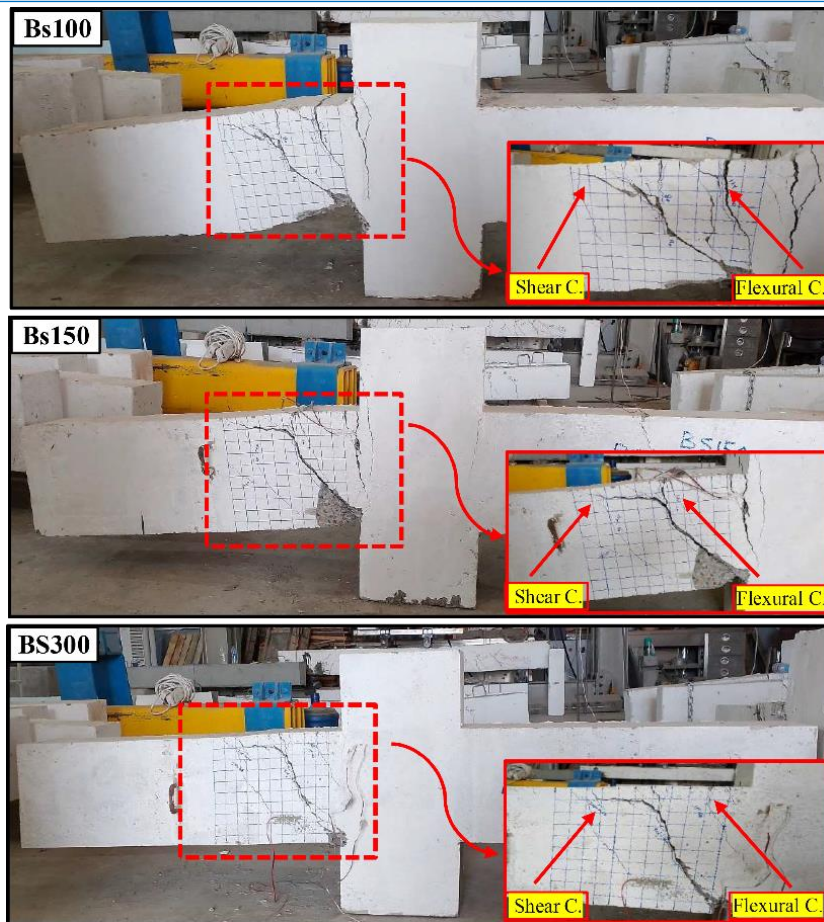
Final Crack Patterns of Group (B) Specimens.
